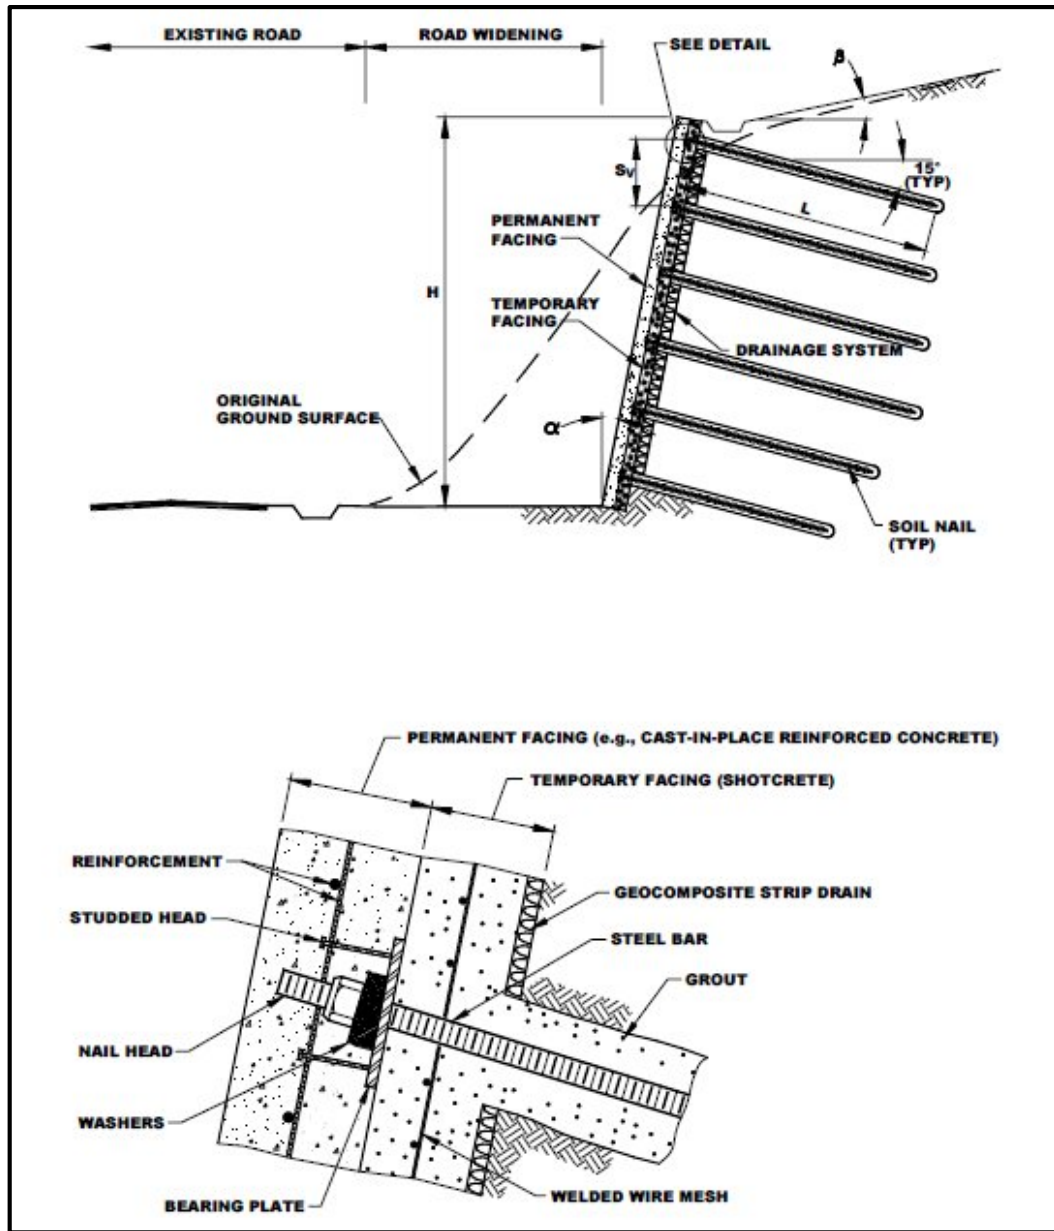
Typical cross section of a soil nail wall (FHWA0-IF-03-017, 2003)
